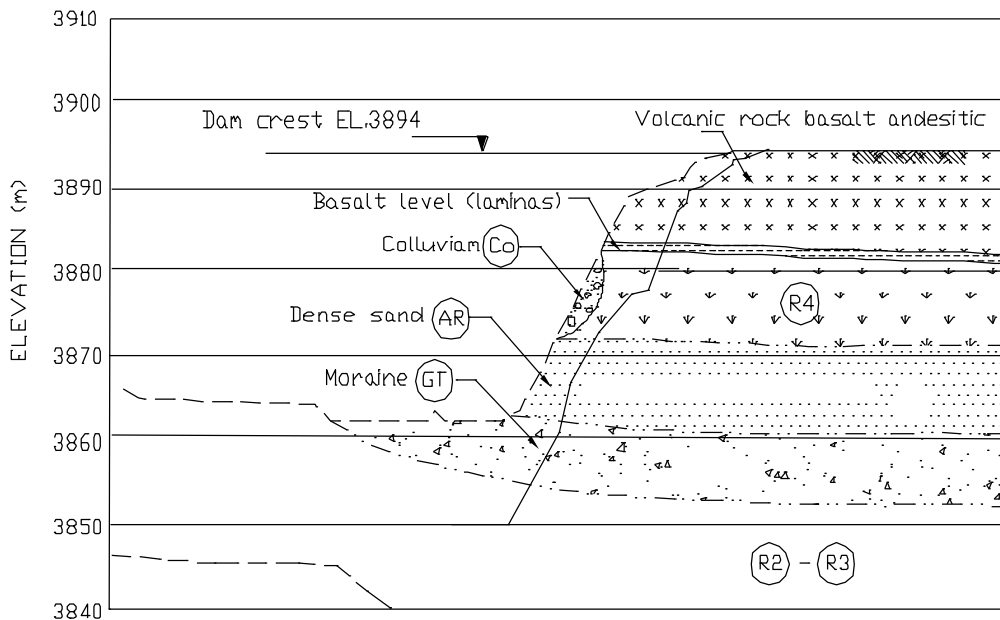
Salve Faccha dam: Right abutment of dam (longitudinal section) as predicted on the basis of exploration
